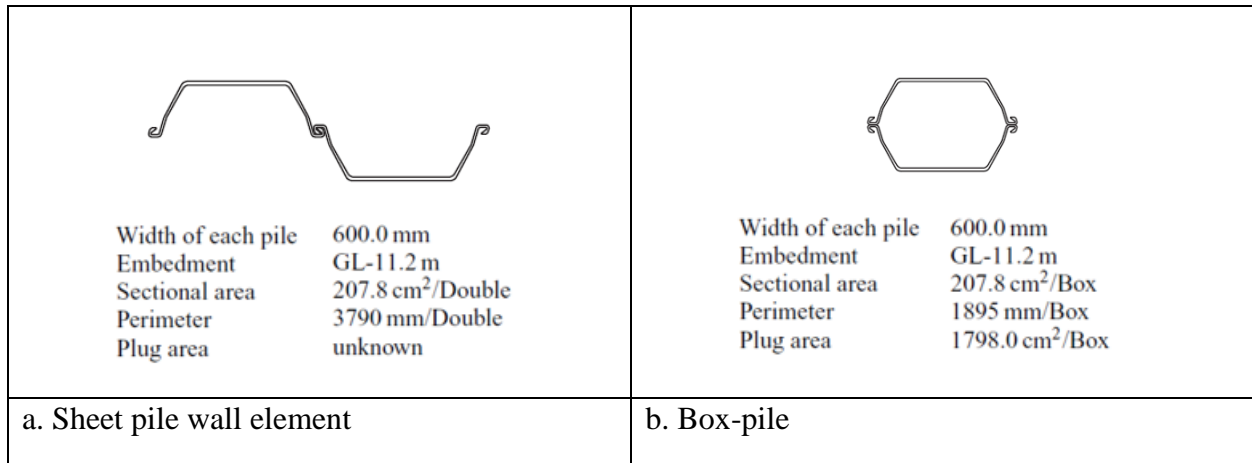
Section and characteristics of the sheet pile wall element and the box-pile (J. Taenaka et al., 2006)
